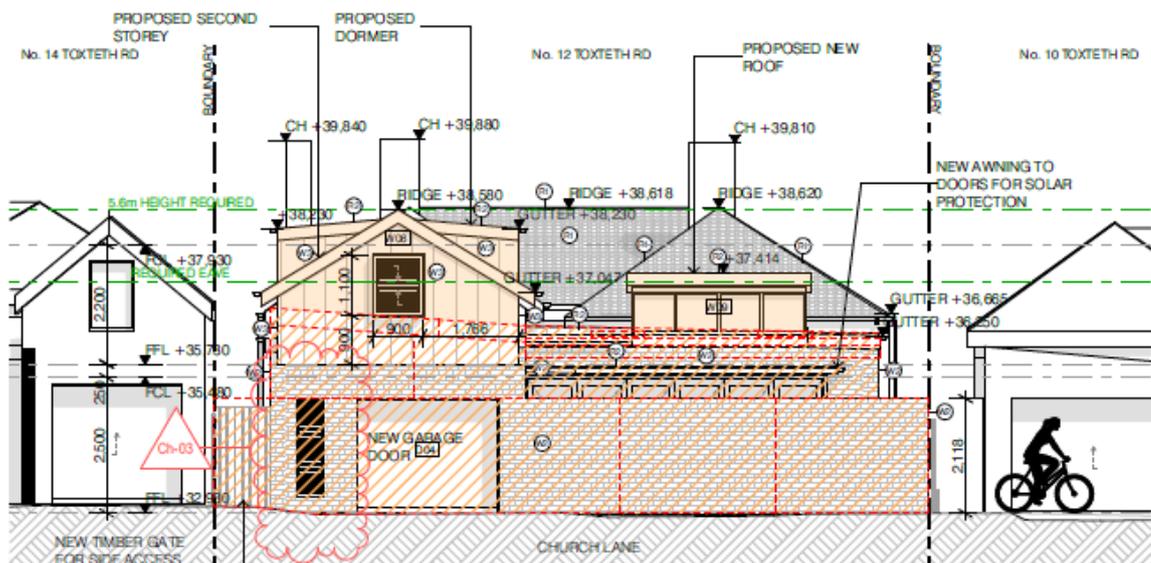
Approved D/2018/681 South-East Elevation (Rear of Site)
